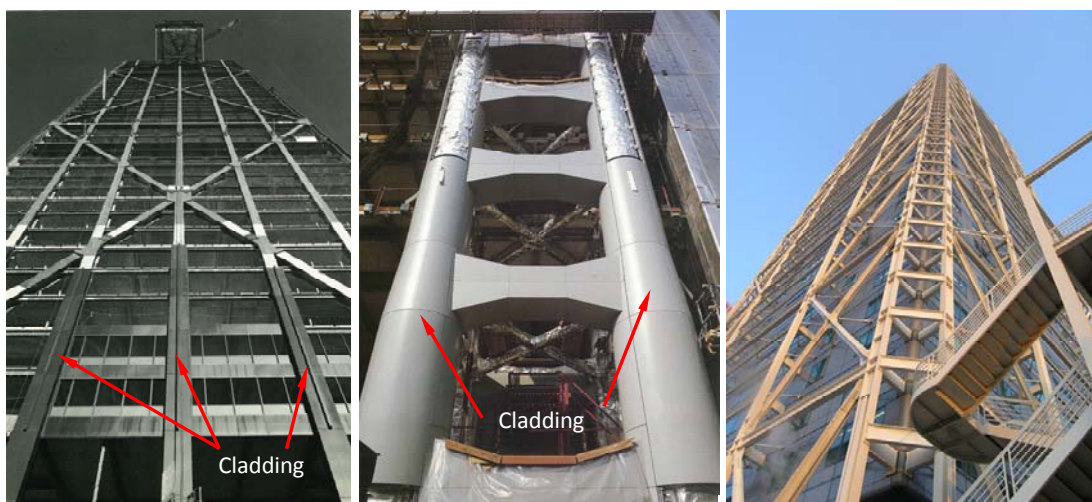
(a) Cladding in the John Hancock Center, Chicago (Stoller, 2000, p. 16); (b) Covered steel columns in HSBC Headquarters, Hong Kong (Lambot, 1986, p. 60); (c) Exposed steel structure in Hotel De Las Artes, Barcelona (Source: <http://en.structurae.de/>)
